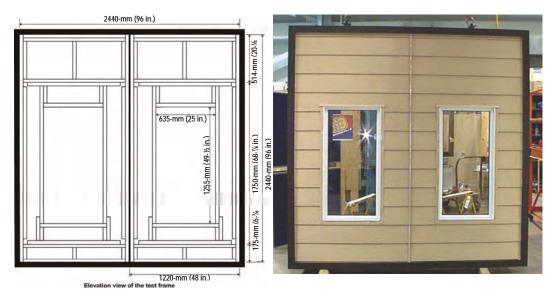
Typical layout of the wall specimen for comparative investigation of the water management response of two side-by-side wall-window interface details (left). Elevation view of the exterior cladding of the specimen completed (right).
